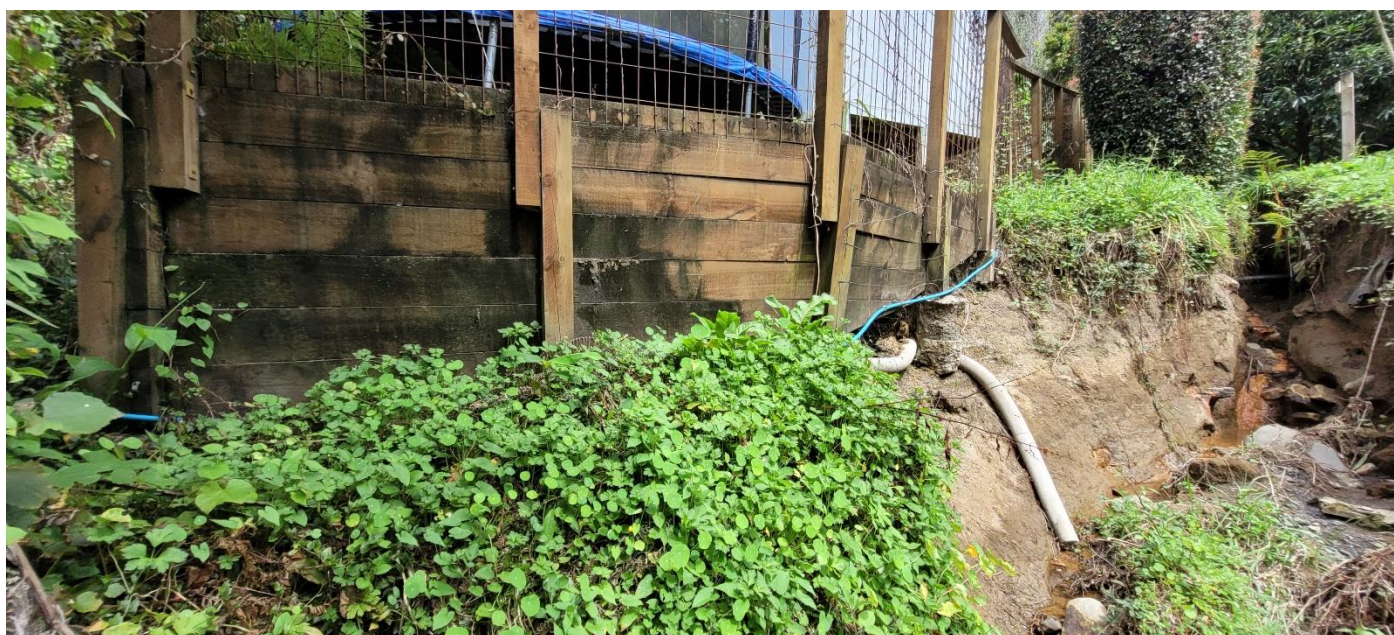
Rotated and undermined sections of RTW-02, looking south.
